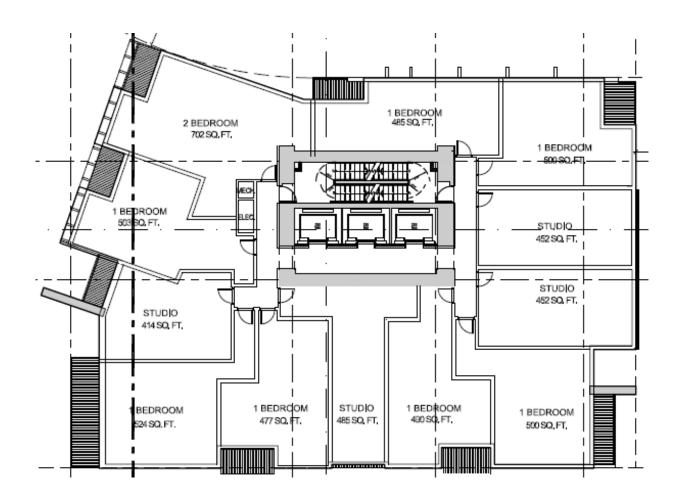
Tower C - Typical Floor Plan (Levels 10-15, 18-23, 26-29)
